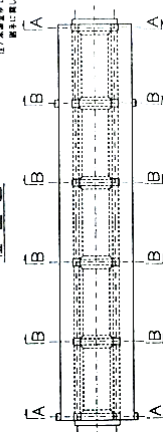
Steel rebar arrangement in beam of rigid-framed railway bridge.
